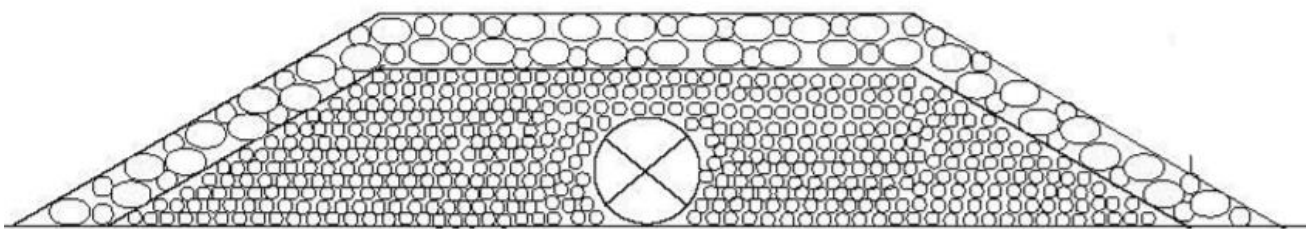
Indicative cross-section of graded rock protection method for pipeline protection
